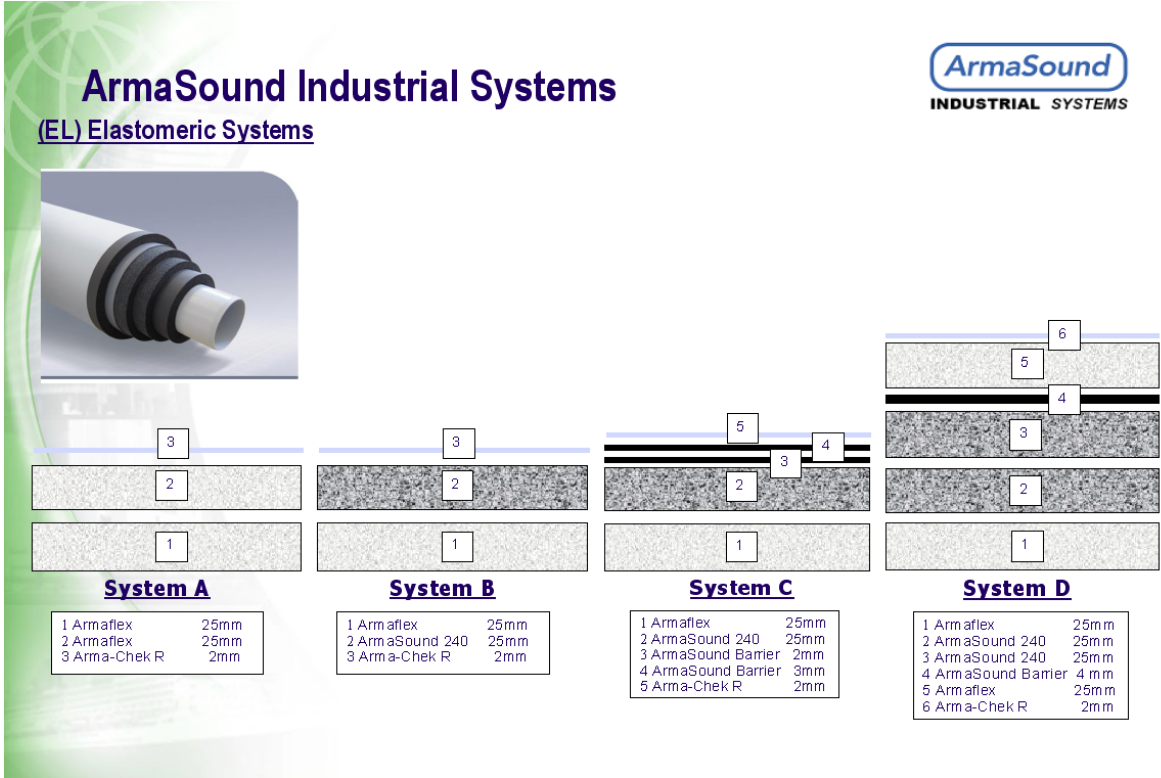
Diagram to show the sandwich construction for each of the 4 ArmaSound Industrial Systems acoustic insulations systems proposed (Inset showing System D configuration).
